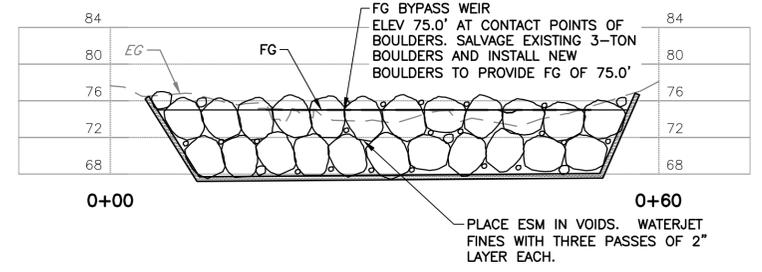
PLAN DETAIL AT CALTRAIN BRIDGE (ESM) PLACEMENT
